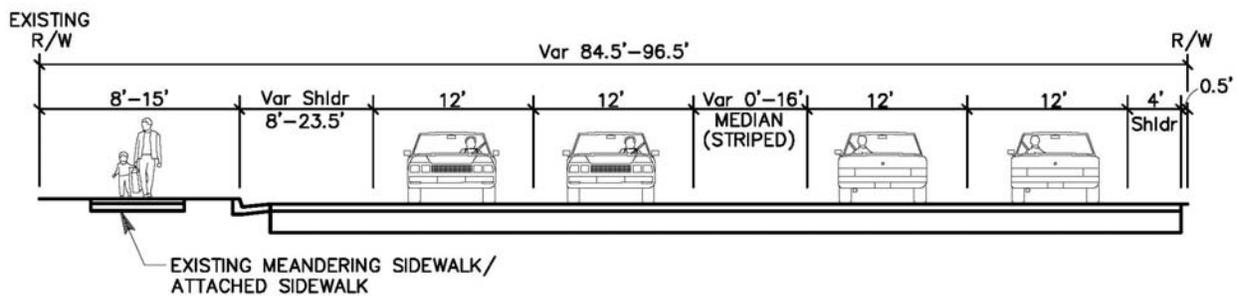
Segment 2 – Interim Roadway Section – Legacy Estates to South Mills Avenue (Looking East)
